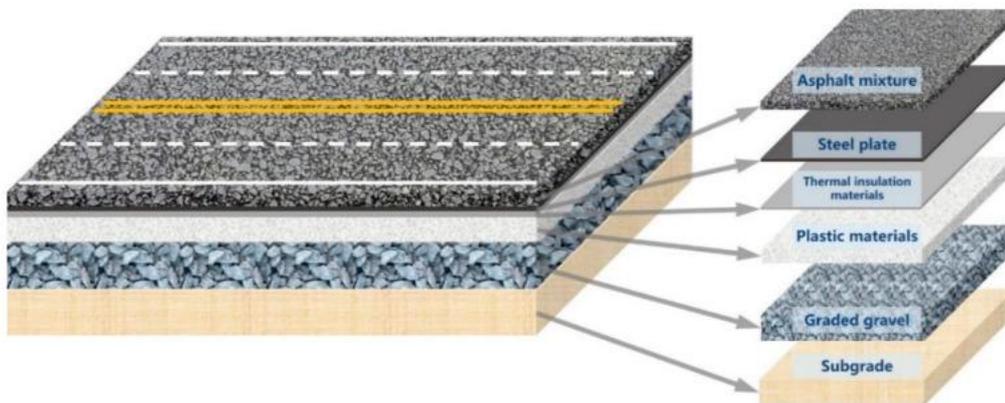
Development of Asphalt steel plastic (ASP) pavement structure (Jiang et al., 2021).
